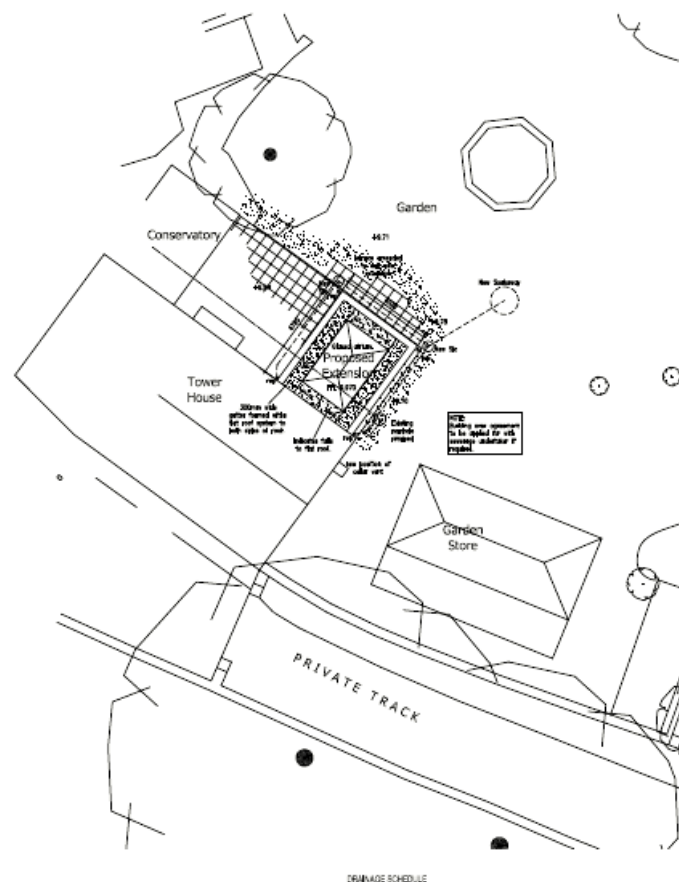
Site plan of proposed development (supplied by client); scale 1:100
